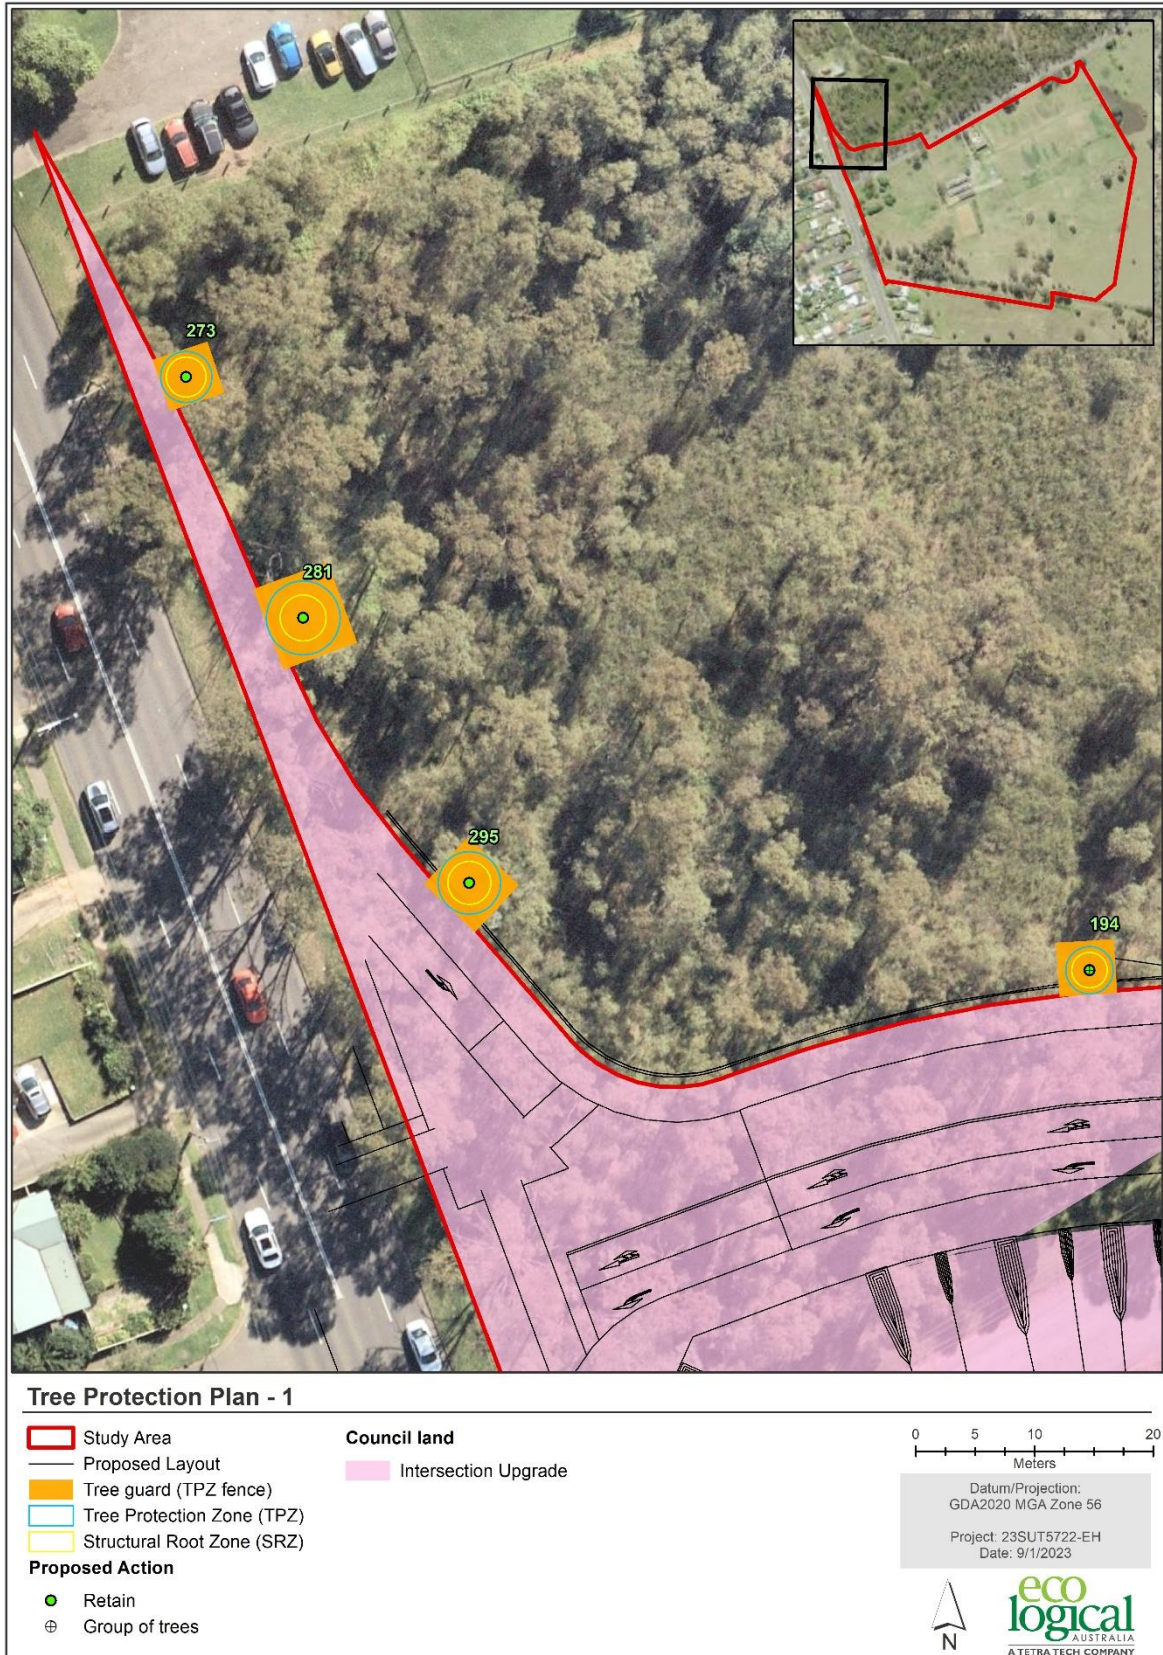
Tree Protection Plan, page 1 (from Tree Protection Plan 1 September 2023)
